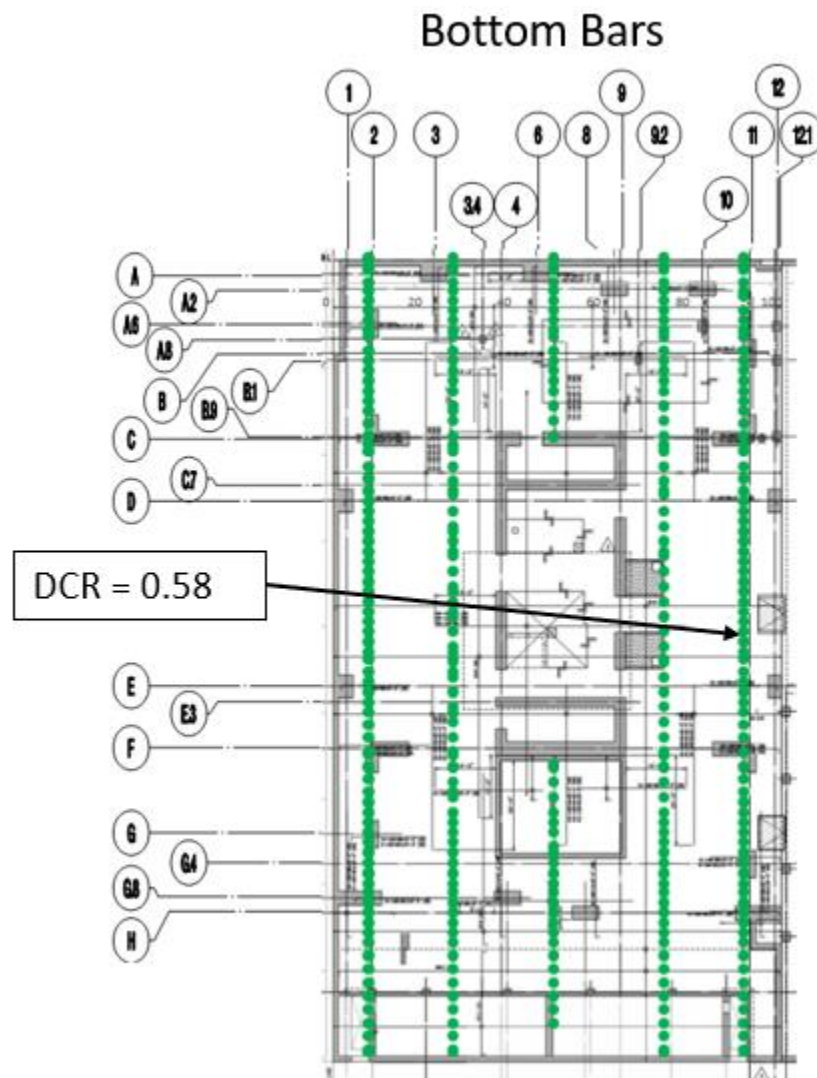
DCR Plot for North - South Bottom Reinforcement Design Strips for Gravity Load Envelope Existing Condition
